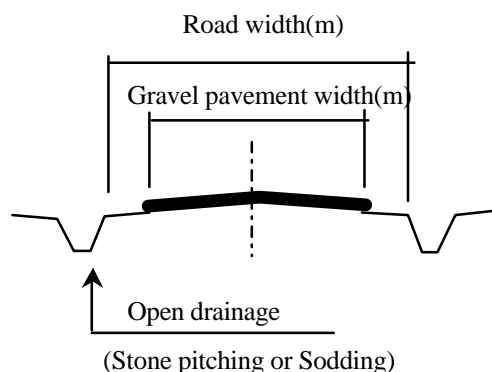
Typical Cross-section of Road Improvement in UUS
